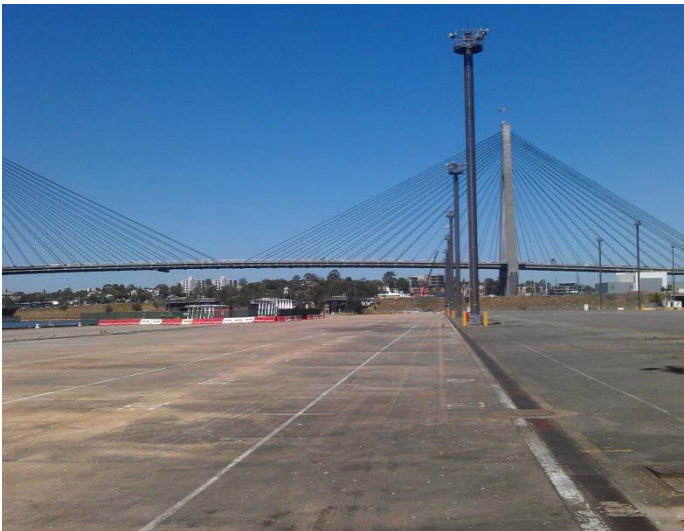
Glebe Island portion facing south showing drainage lines in the northwestern portion
